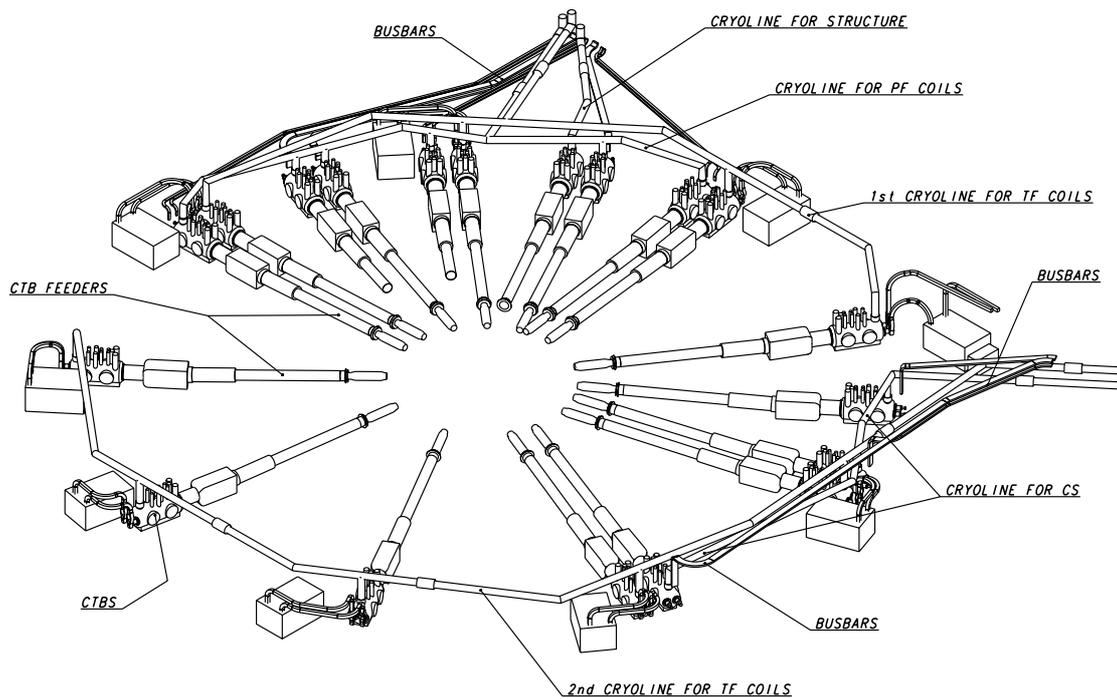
Isometrical View of Cryolines at the Lower CTB level of the Tokamak building
